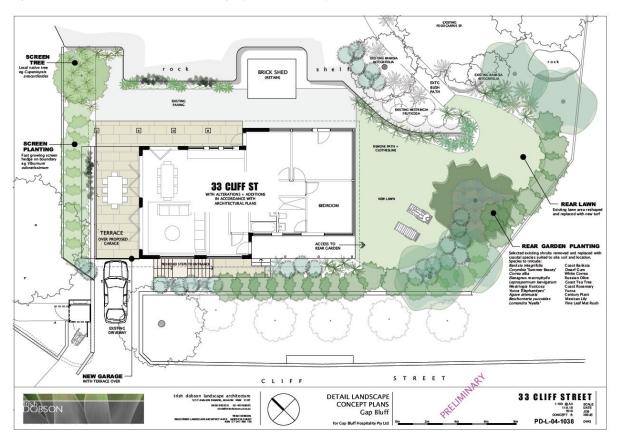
Proposed works at 33 Cliff Street. (Source: JPW 2015)
